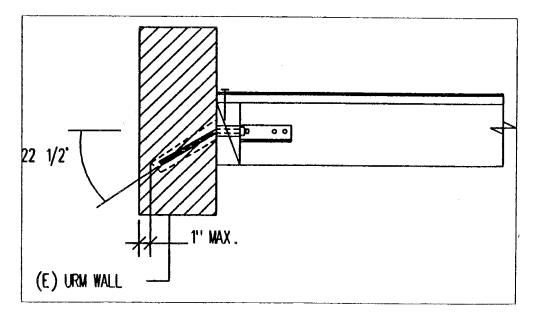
Attachment of unreinforced masonry walls to floor joists or where roof rafters where the roof is approximately flat.
